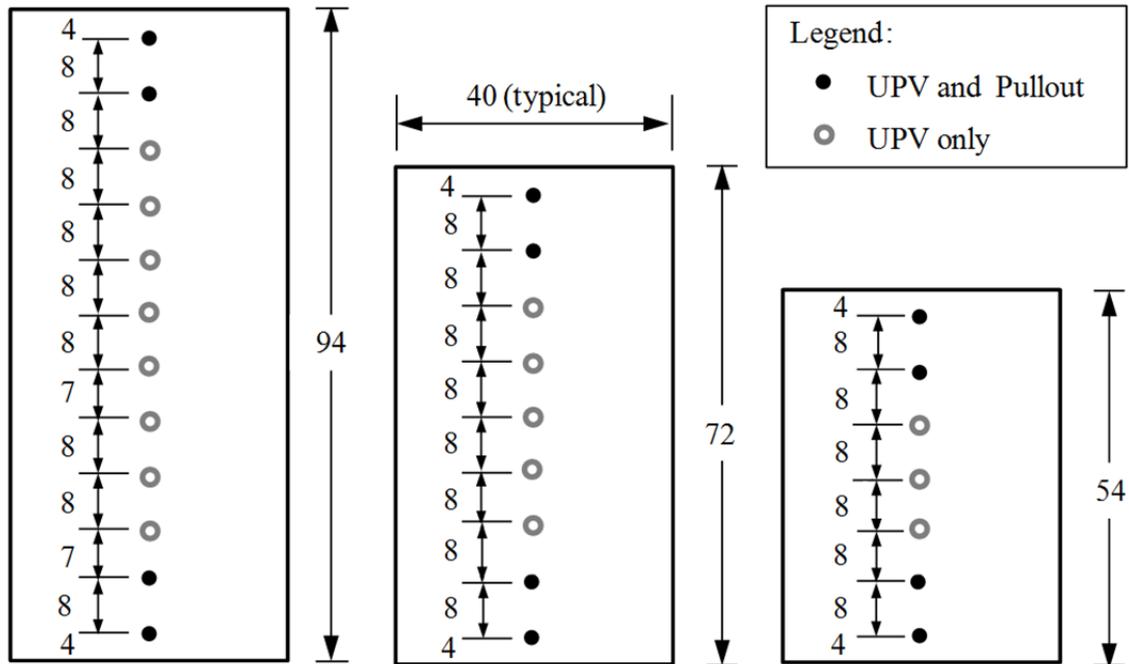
Location of UPV measurement and pullout testing locations on SCC-3 and SCC-4 walls (*Note: All measurements in inches*)
